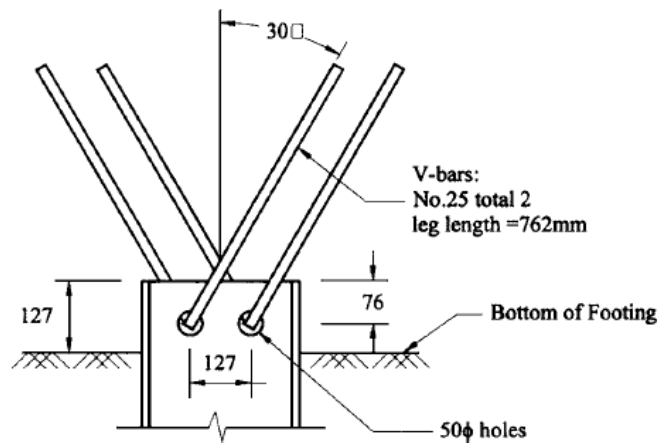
Typical Steel Pile-to-Concrete-Pile Cap Connection (Xiao, Wu et al. 2006)
